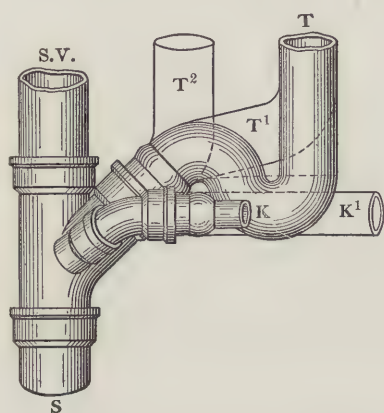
LEAD TRAP CLOSET AND HOPPER BRANCHES, WITH SIDE OPENING IN SOIL PIPE STACK FOR BRANCH WASTE FOR BATH, ETC., INDICATED
